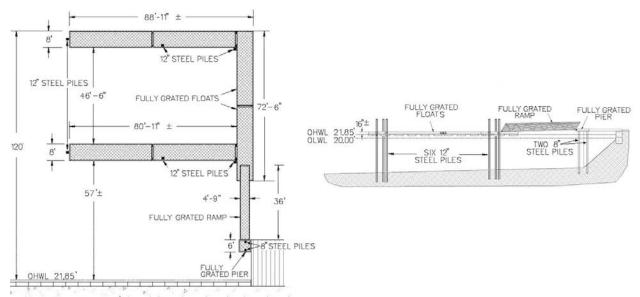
Plan and profile drawings of the SECO Southport eastern mooring float. (Adapted from SECO 2019c, Pages 3 and 4 of 5).
